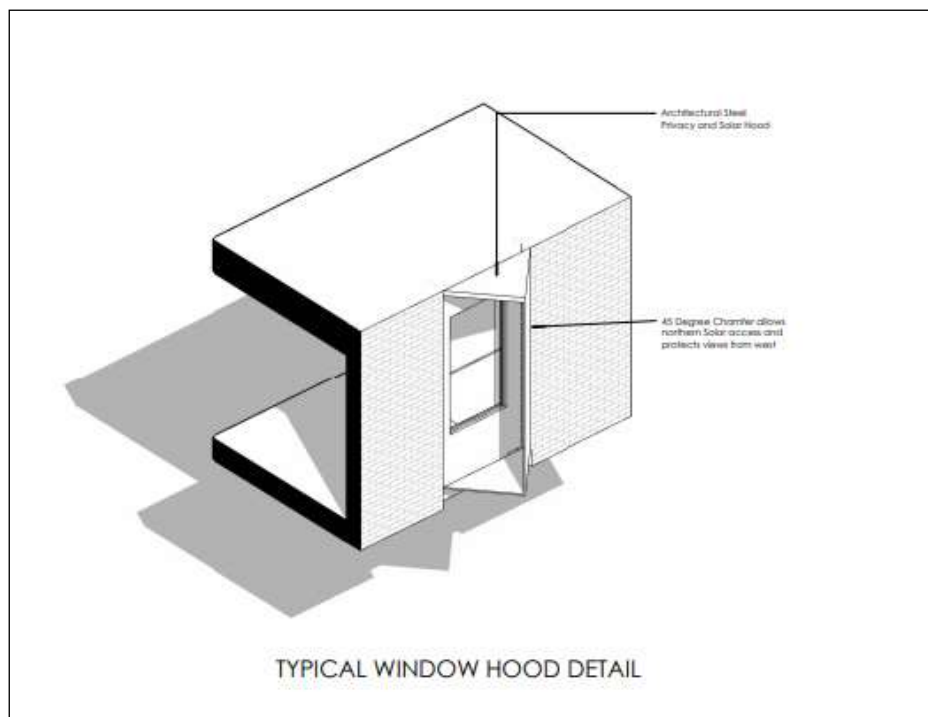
window hoods for privacy to side dwelling facades on upper levels
